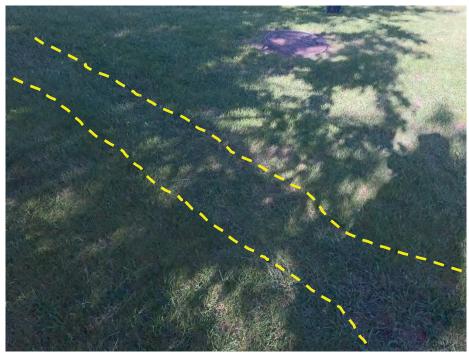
Shallow ground depression south of apartment complex. Facing west.
